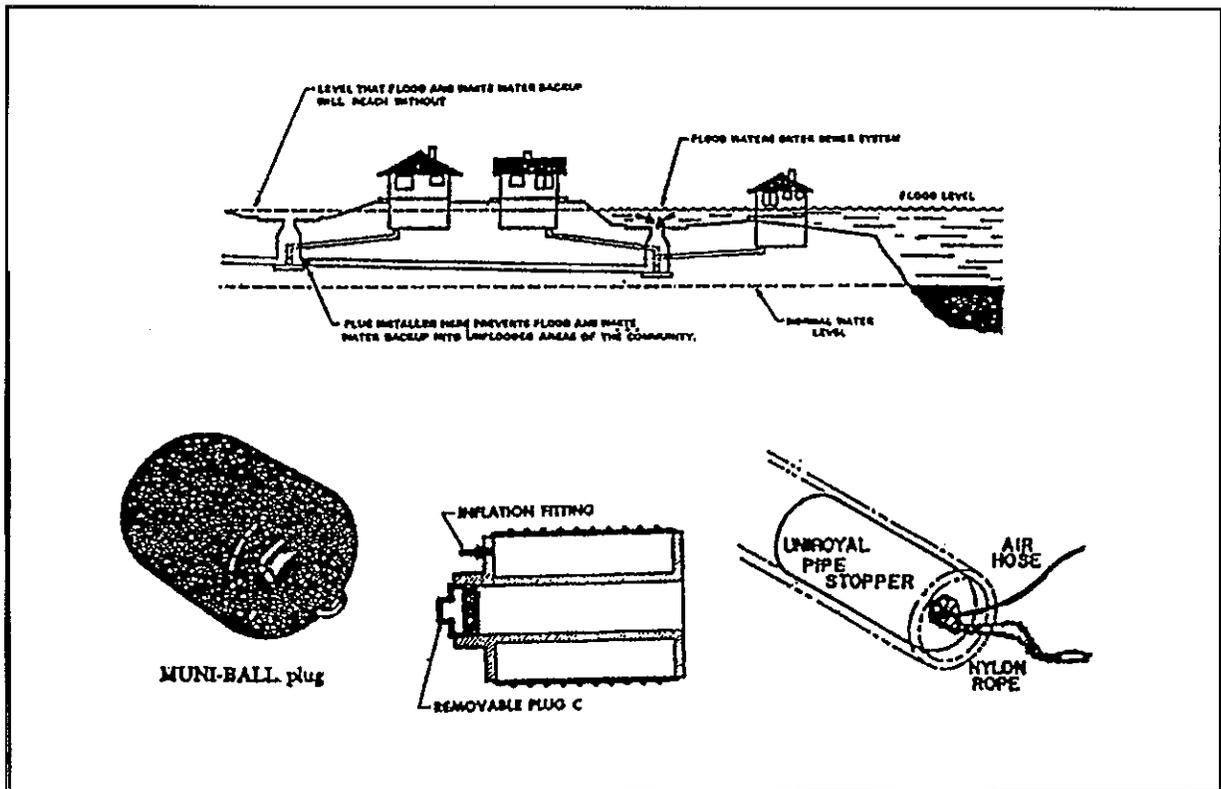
Prefabricated rubber pipe stoppers for outlet opening of a manhole
